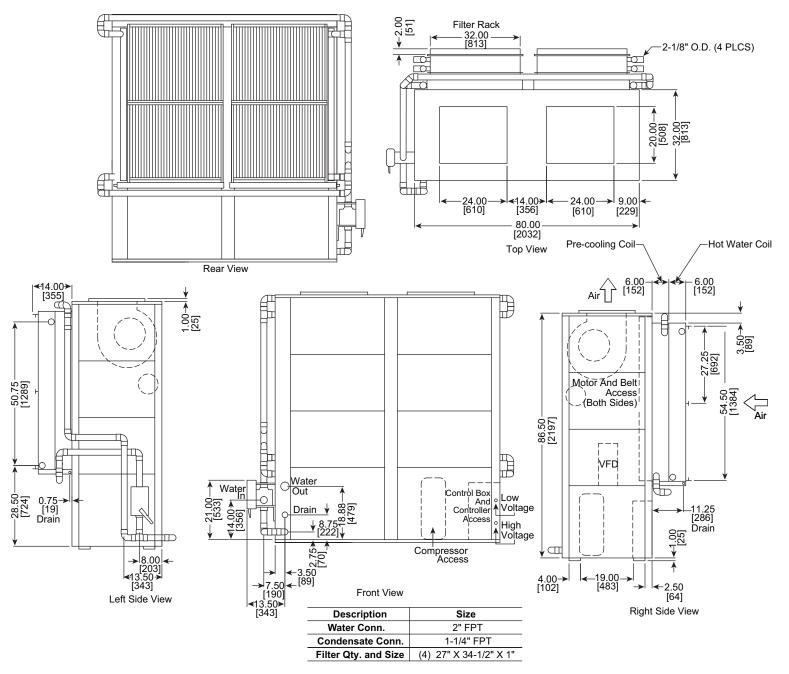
50BVJ 034 Dimensions Rear Return, Top Supply with Waterside Economizer and Hot Water Coil
